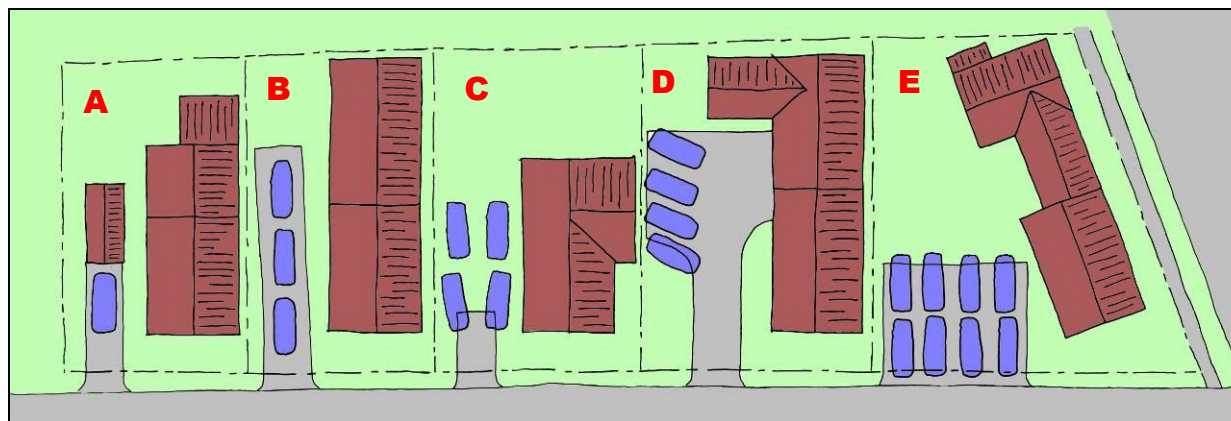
Several examples of parking arrangements found in intown neighborhoods. Lot A has a standard single width driveway with a detached single car garage set back from the face of the building so that it does not detract from the streetscape. Lot B shows a typical single width driveway with multiple cars parked end-to-end. Lot C shows how a single, paved parking space has grown into four unpaved spaces that will very likely get paved at some time in the future – adding impervious cover and eliminating lawn area. Lot D has a paved parking lot in the side yard but the parking demand has begun to spill over onto the lawn. Lot E has a compact, double-deep parking
